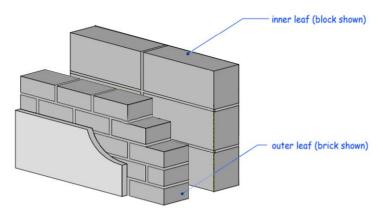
Masonry and Brick Cavity Wall Illustration (SBSA Technical Guide, n.d.)
